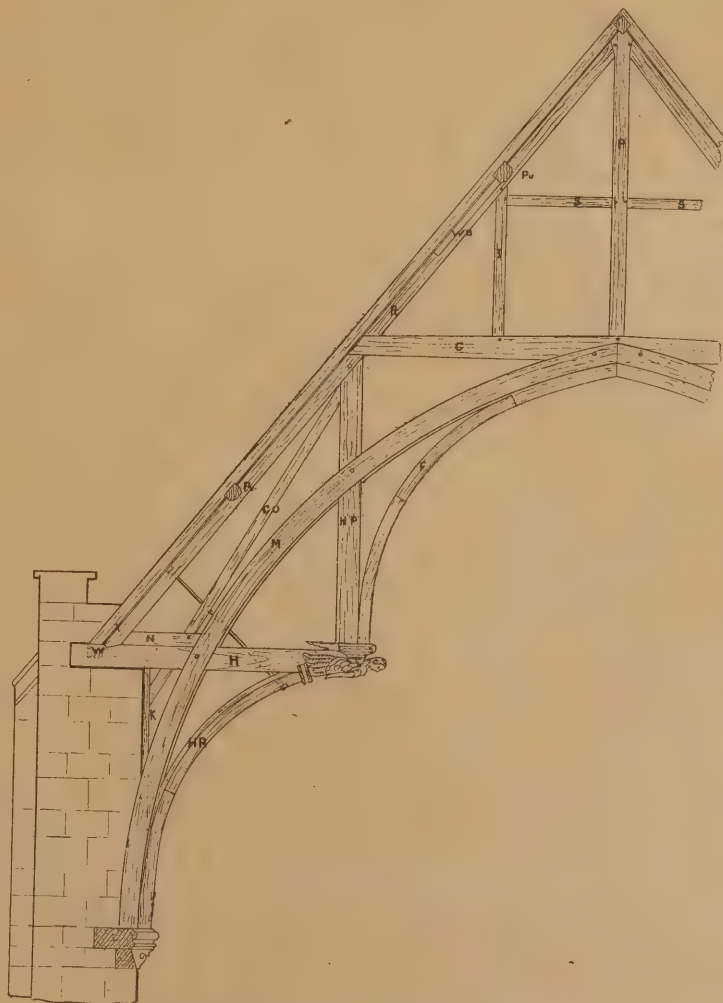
OUTLINES OF WESTMINSTER HALL ROOF.
